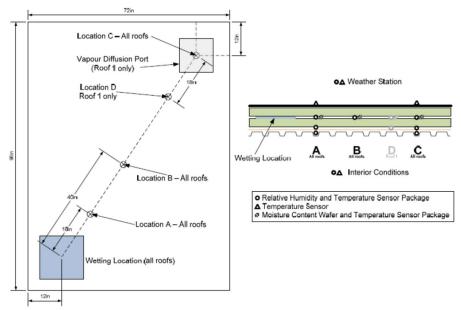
Schematic of test roof assembly with sensors and dimensions
